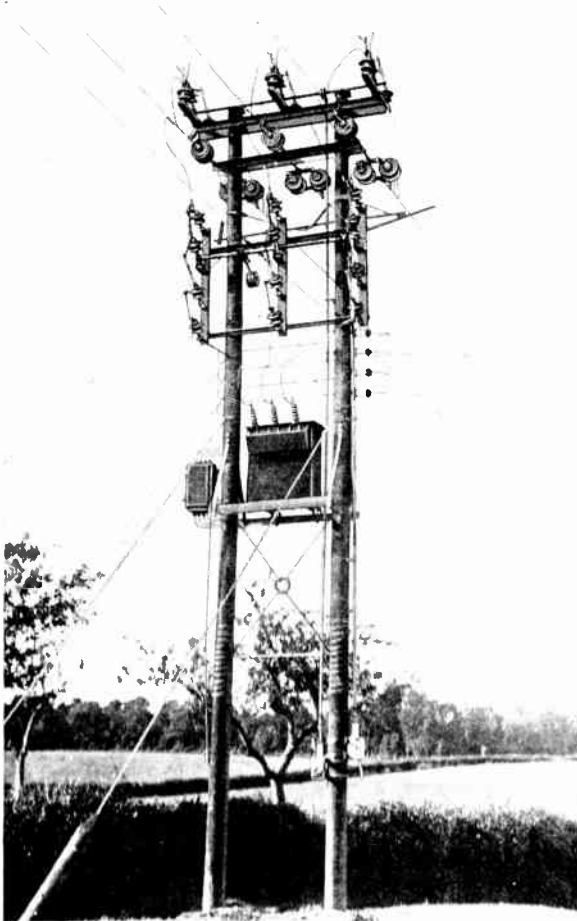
“H” POLE OUTDOOR SUBSTATION (WITH H.T. SWITCHGEAR AND TRANSFORMER). Showing H.T. lines above and L.T. below. (Pirelli-General Cable Works, Ltd.)
